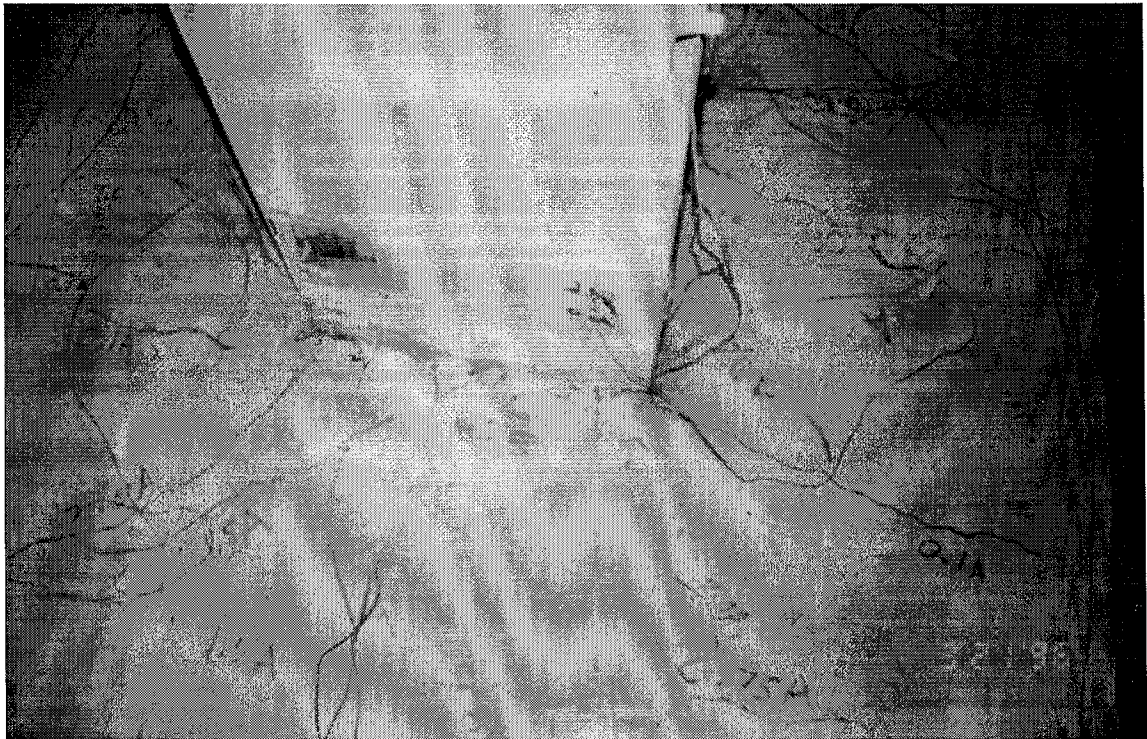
Top View of Concrete Slab-Column Interface (West Girder of Specimen 3)
